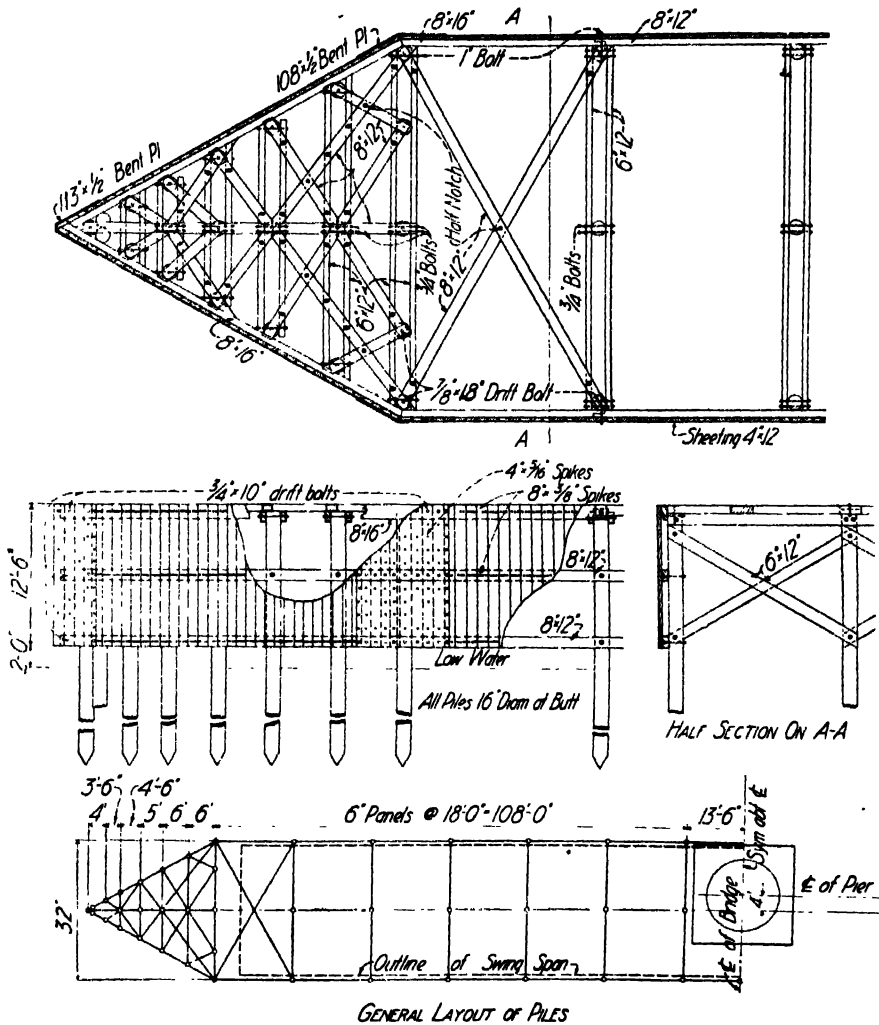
Draw Protection for the Lulu Island Bridge in British Columbia.
